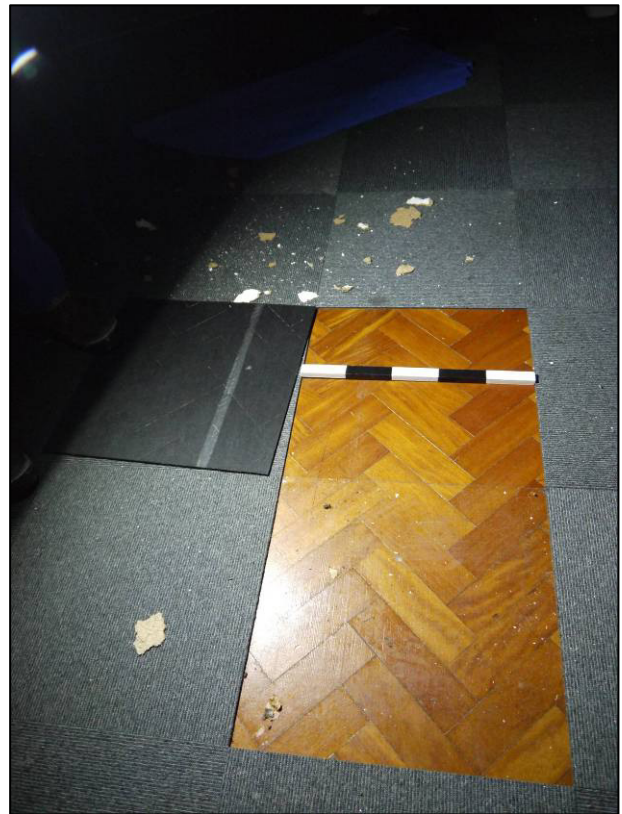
1960 kitchen and dining block (Block 4), parquet floor to dining hall (G/001), looking NE (photo 1/070).
